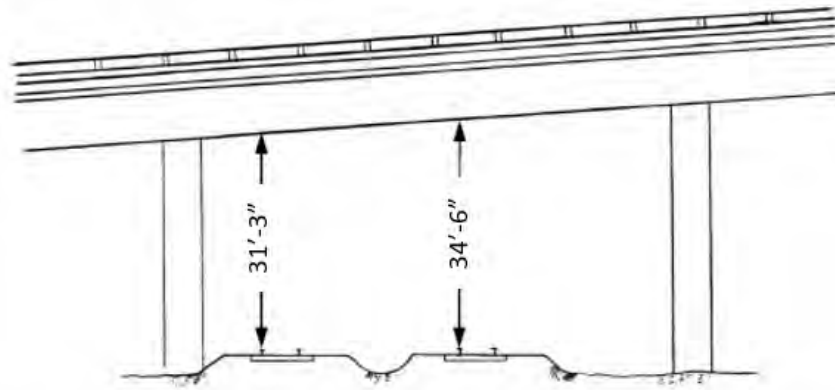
Bridge elevation view with two freight/passenger rail tracks below the bridge (Example 1)
